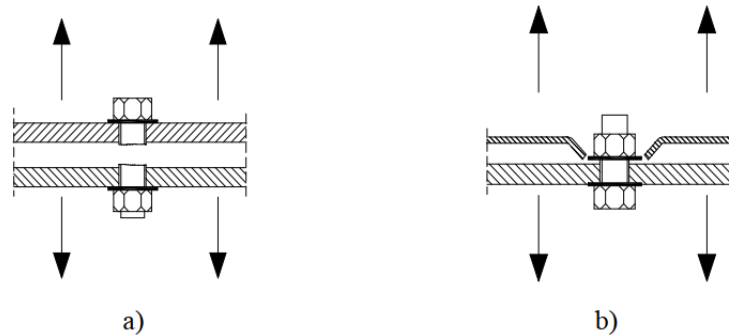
Failure modes for bolted connections in tension (Dubina et al., 2013).
